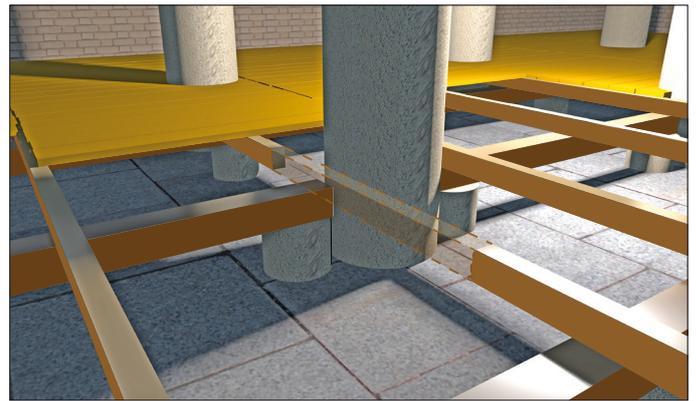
Sanam Abu Dom. Chamber 6 in the Treasury, hypothetical arrangement of girders resting on the dwarf columns, the joists and floorboards, with detail of the relationship adjacent to the central row of roof-supporting columns.
